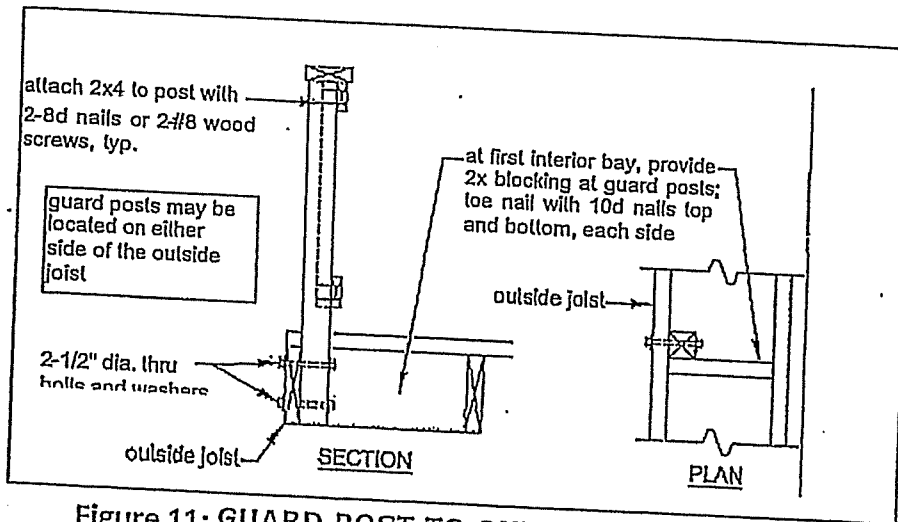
GUARD POST TO OUTSIDE JOIST DETAIL
